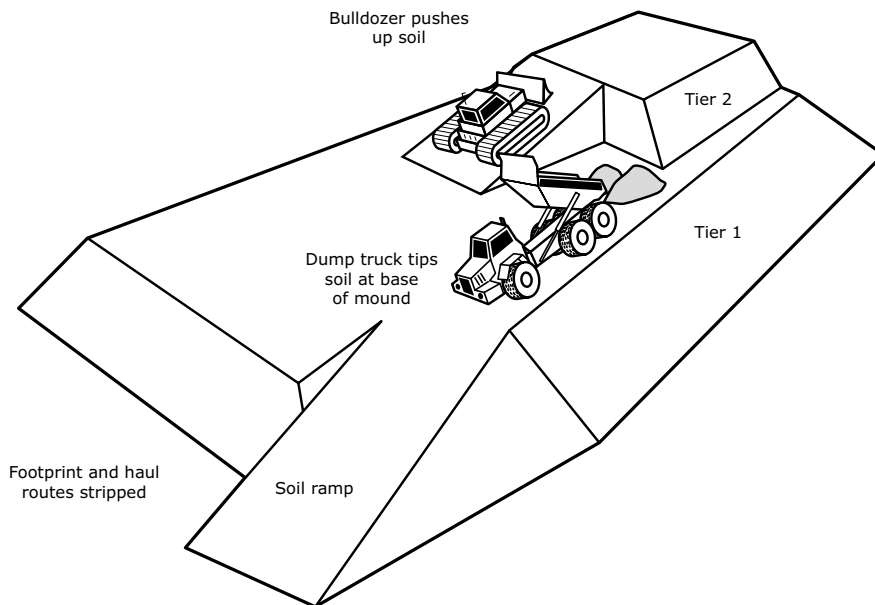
Soil storage mound construction with bulldozers and dump trucks: Multi-tier mound..
